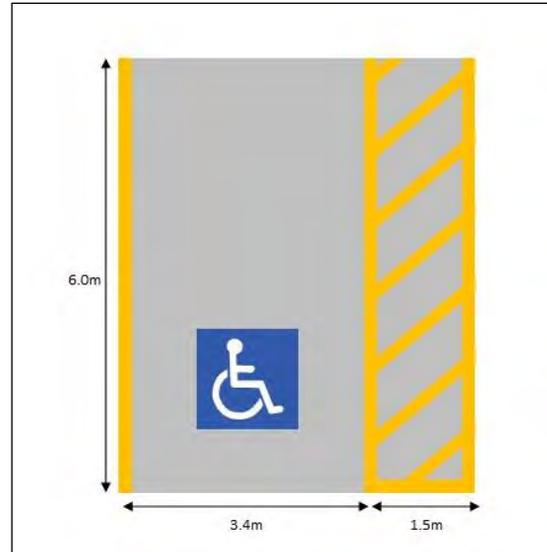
ONE (1) BARRIER-FREE PARKING SPACE WITH AISLE.
